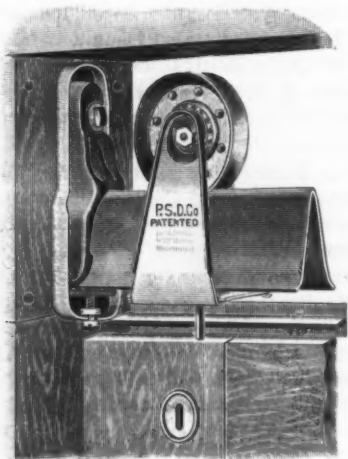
Perfect Sliding Door Hanger, Sectional View.
